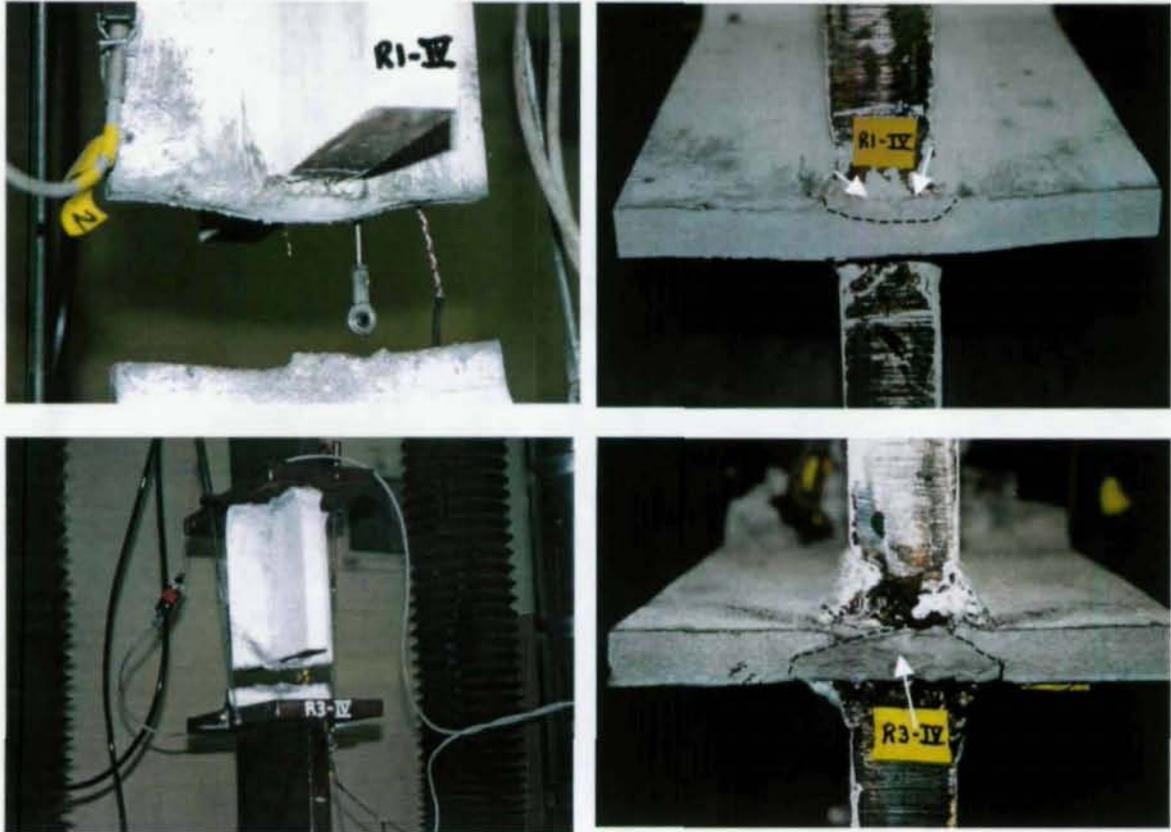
Ductile/Brittle Fracture of Rotary Straightened Type IV Specimens. Arrows Show Ductile Tearing Region.
